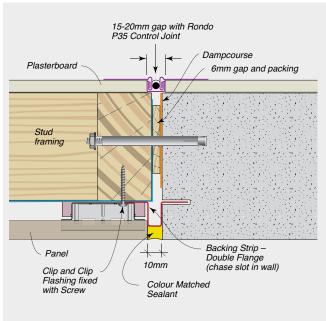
Second Storey Junction with Brick Veneer or Masonry Wall – Cantilevered Framing
